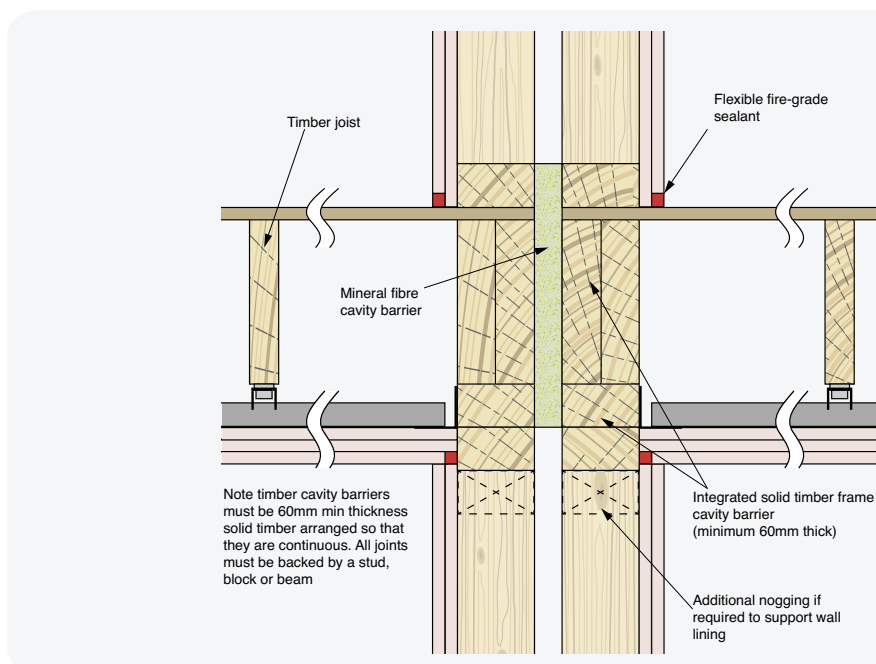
FRL 120/120/120 Fire-protected timber frame wall/floor junction with integral cavity barriers – beams parallel to wall
